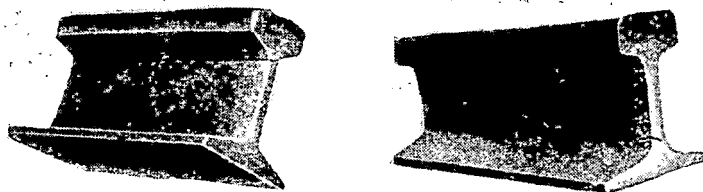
Longitudinal cracks in the upper and lower fillet areas.
